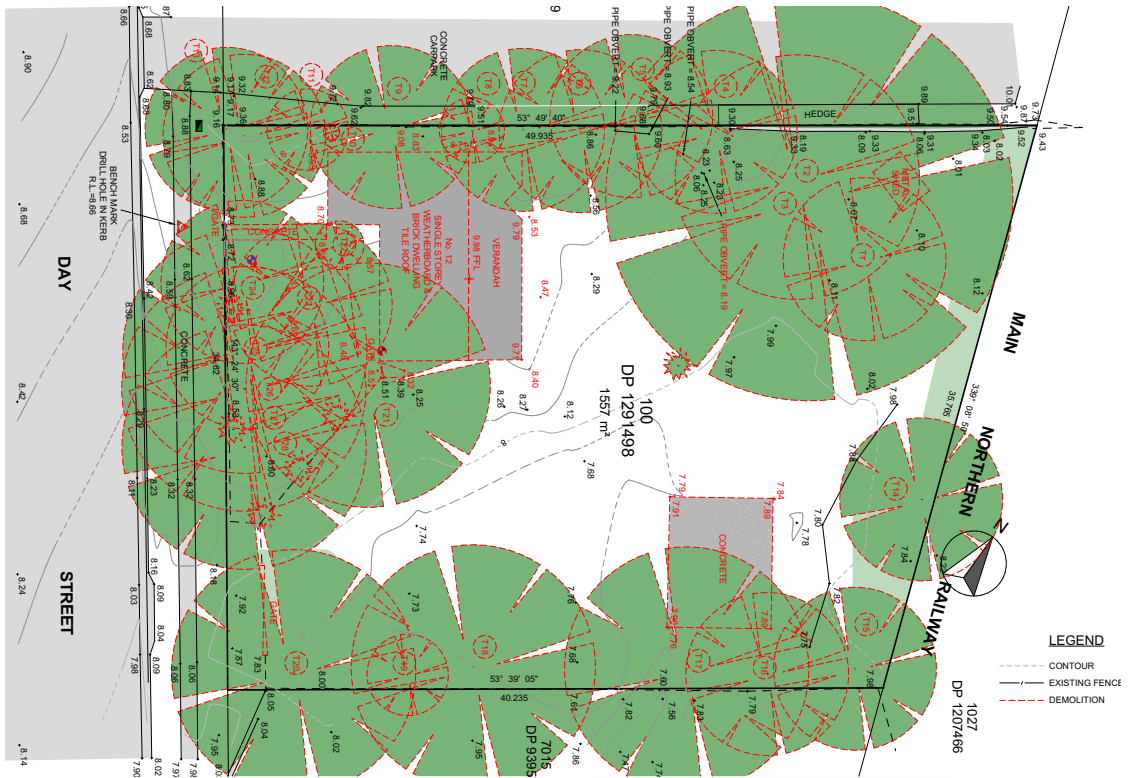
Survey source SORENSEN DESIGN & PLANNING
